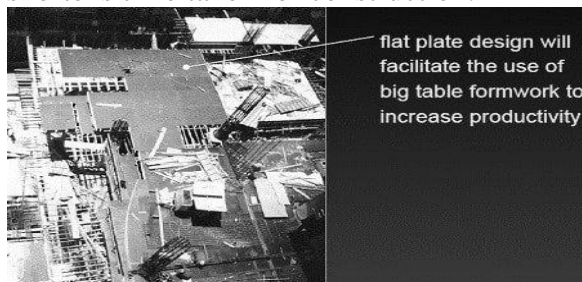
Big Table Formwork Facilitating Shorter Construction Time
